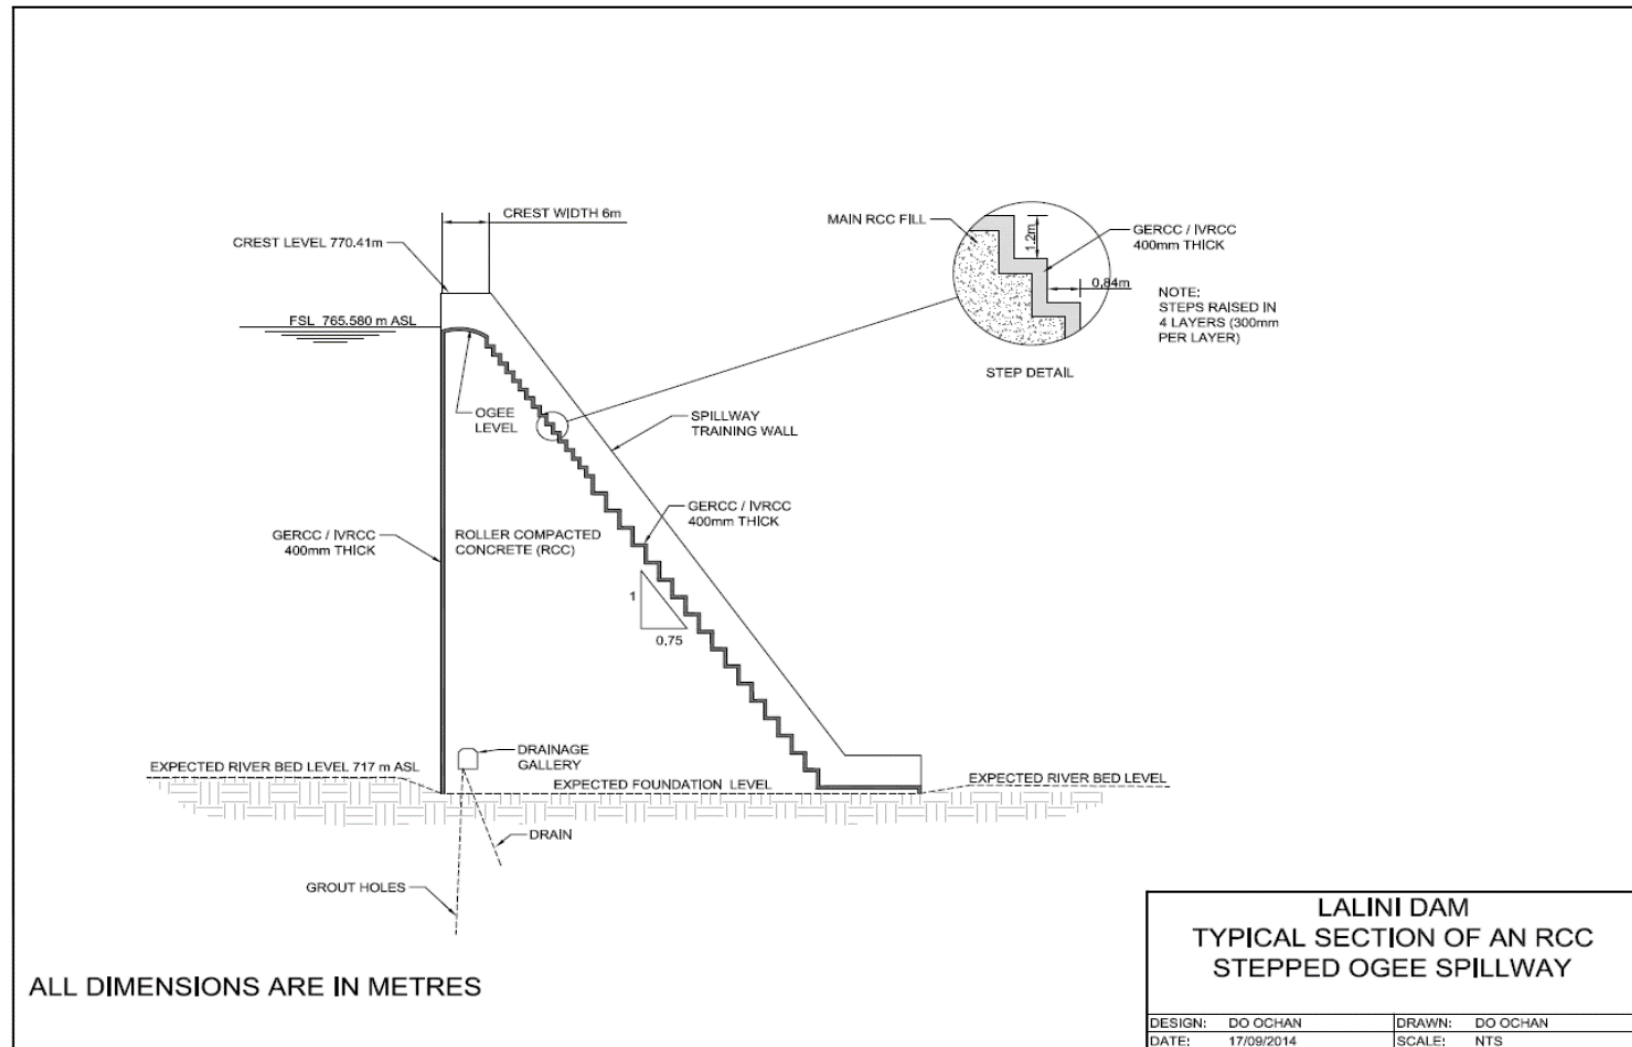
RCC Dam Wall and Spillway Typical Cross Section
